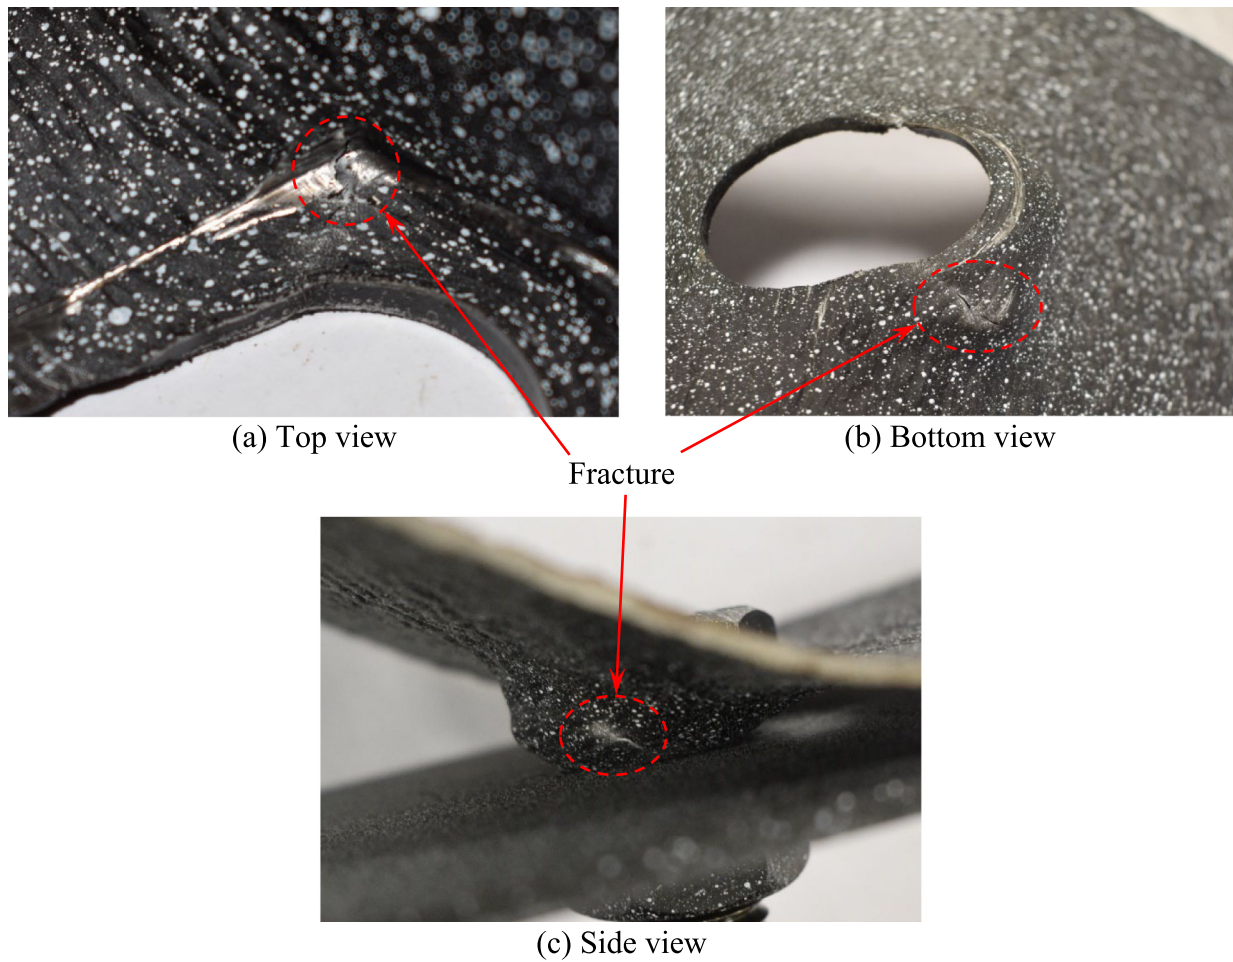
Close-up view of bolt head penetrating into plate – curl-bearing failure (Specimen S3-145-104-90).
